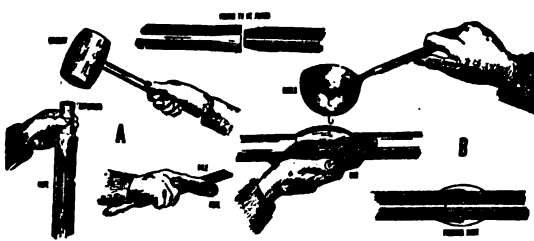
Preparing to join two pieces of pipe and method of wiping a joint.
